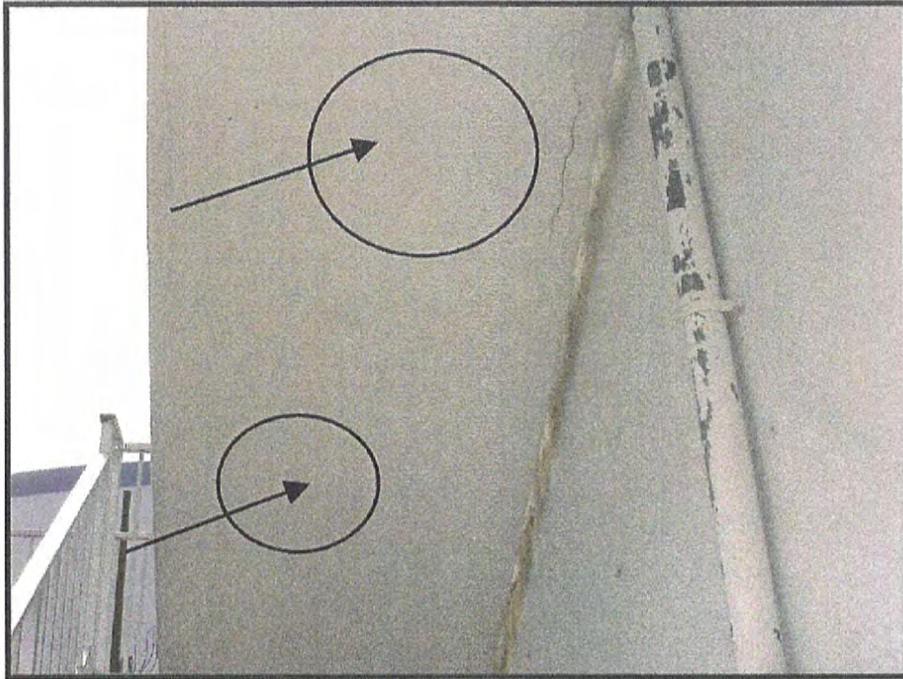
Delaminated Areas along bottom face of top stair run for North exterior stair.
